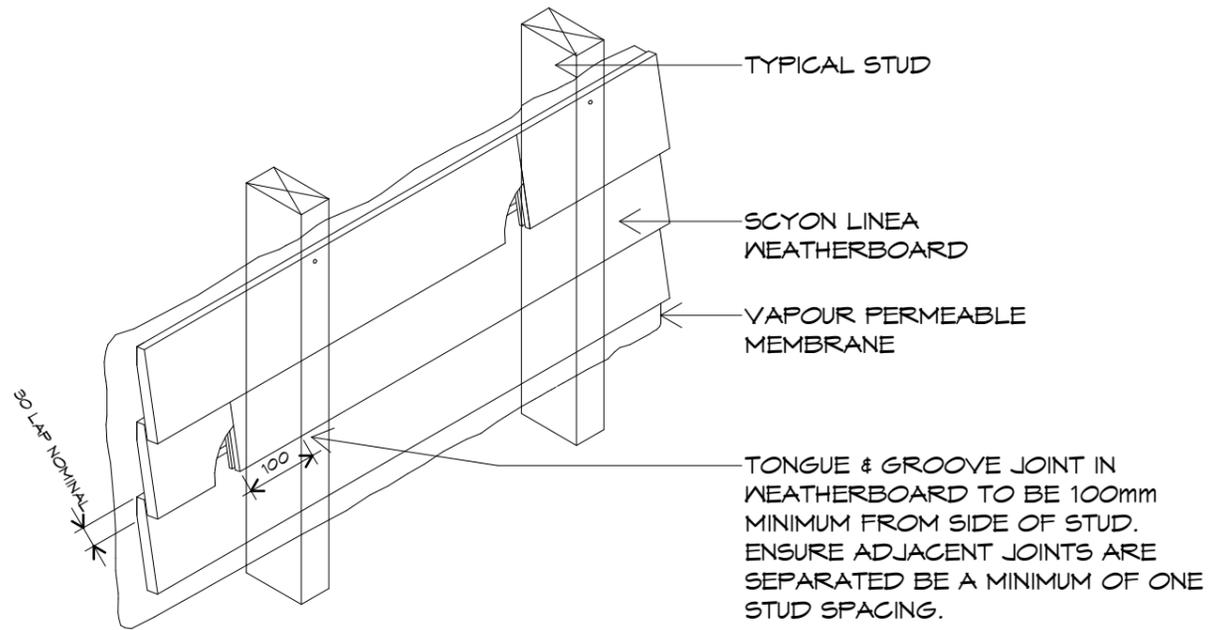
TONGUE AND GROOVE JOINT OFF STUD
